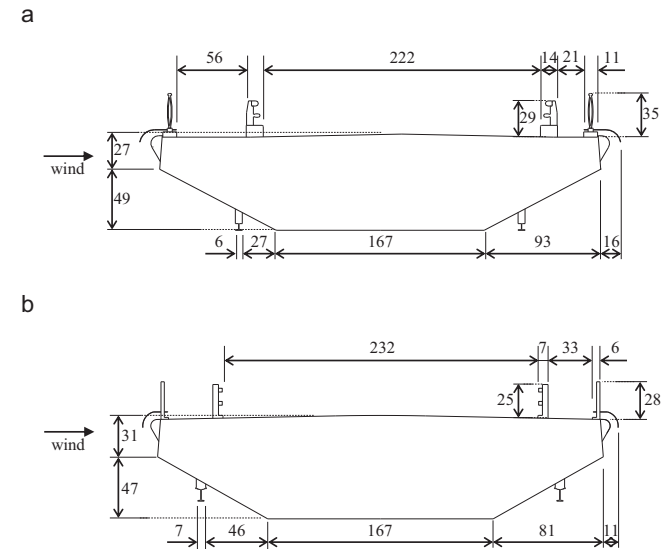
Dimension (mm) of section models: (a) B2 and (b) B1.
